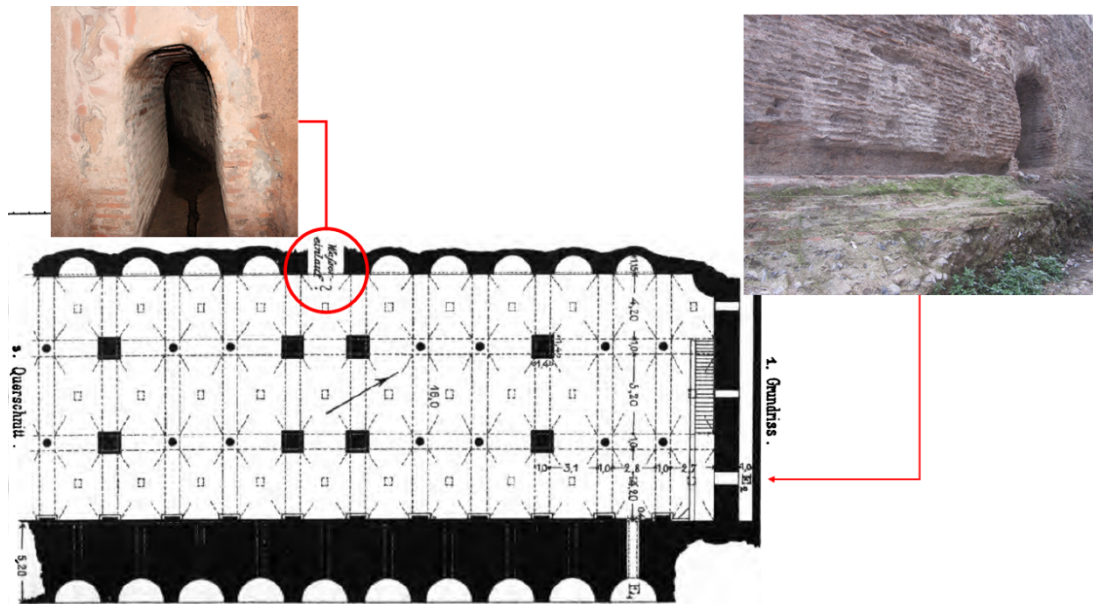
Unkapanı cistern plan (Forchheimer & Strzygowski 1893) and photographs of the two openings.
